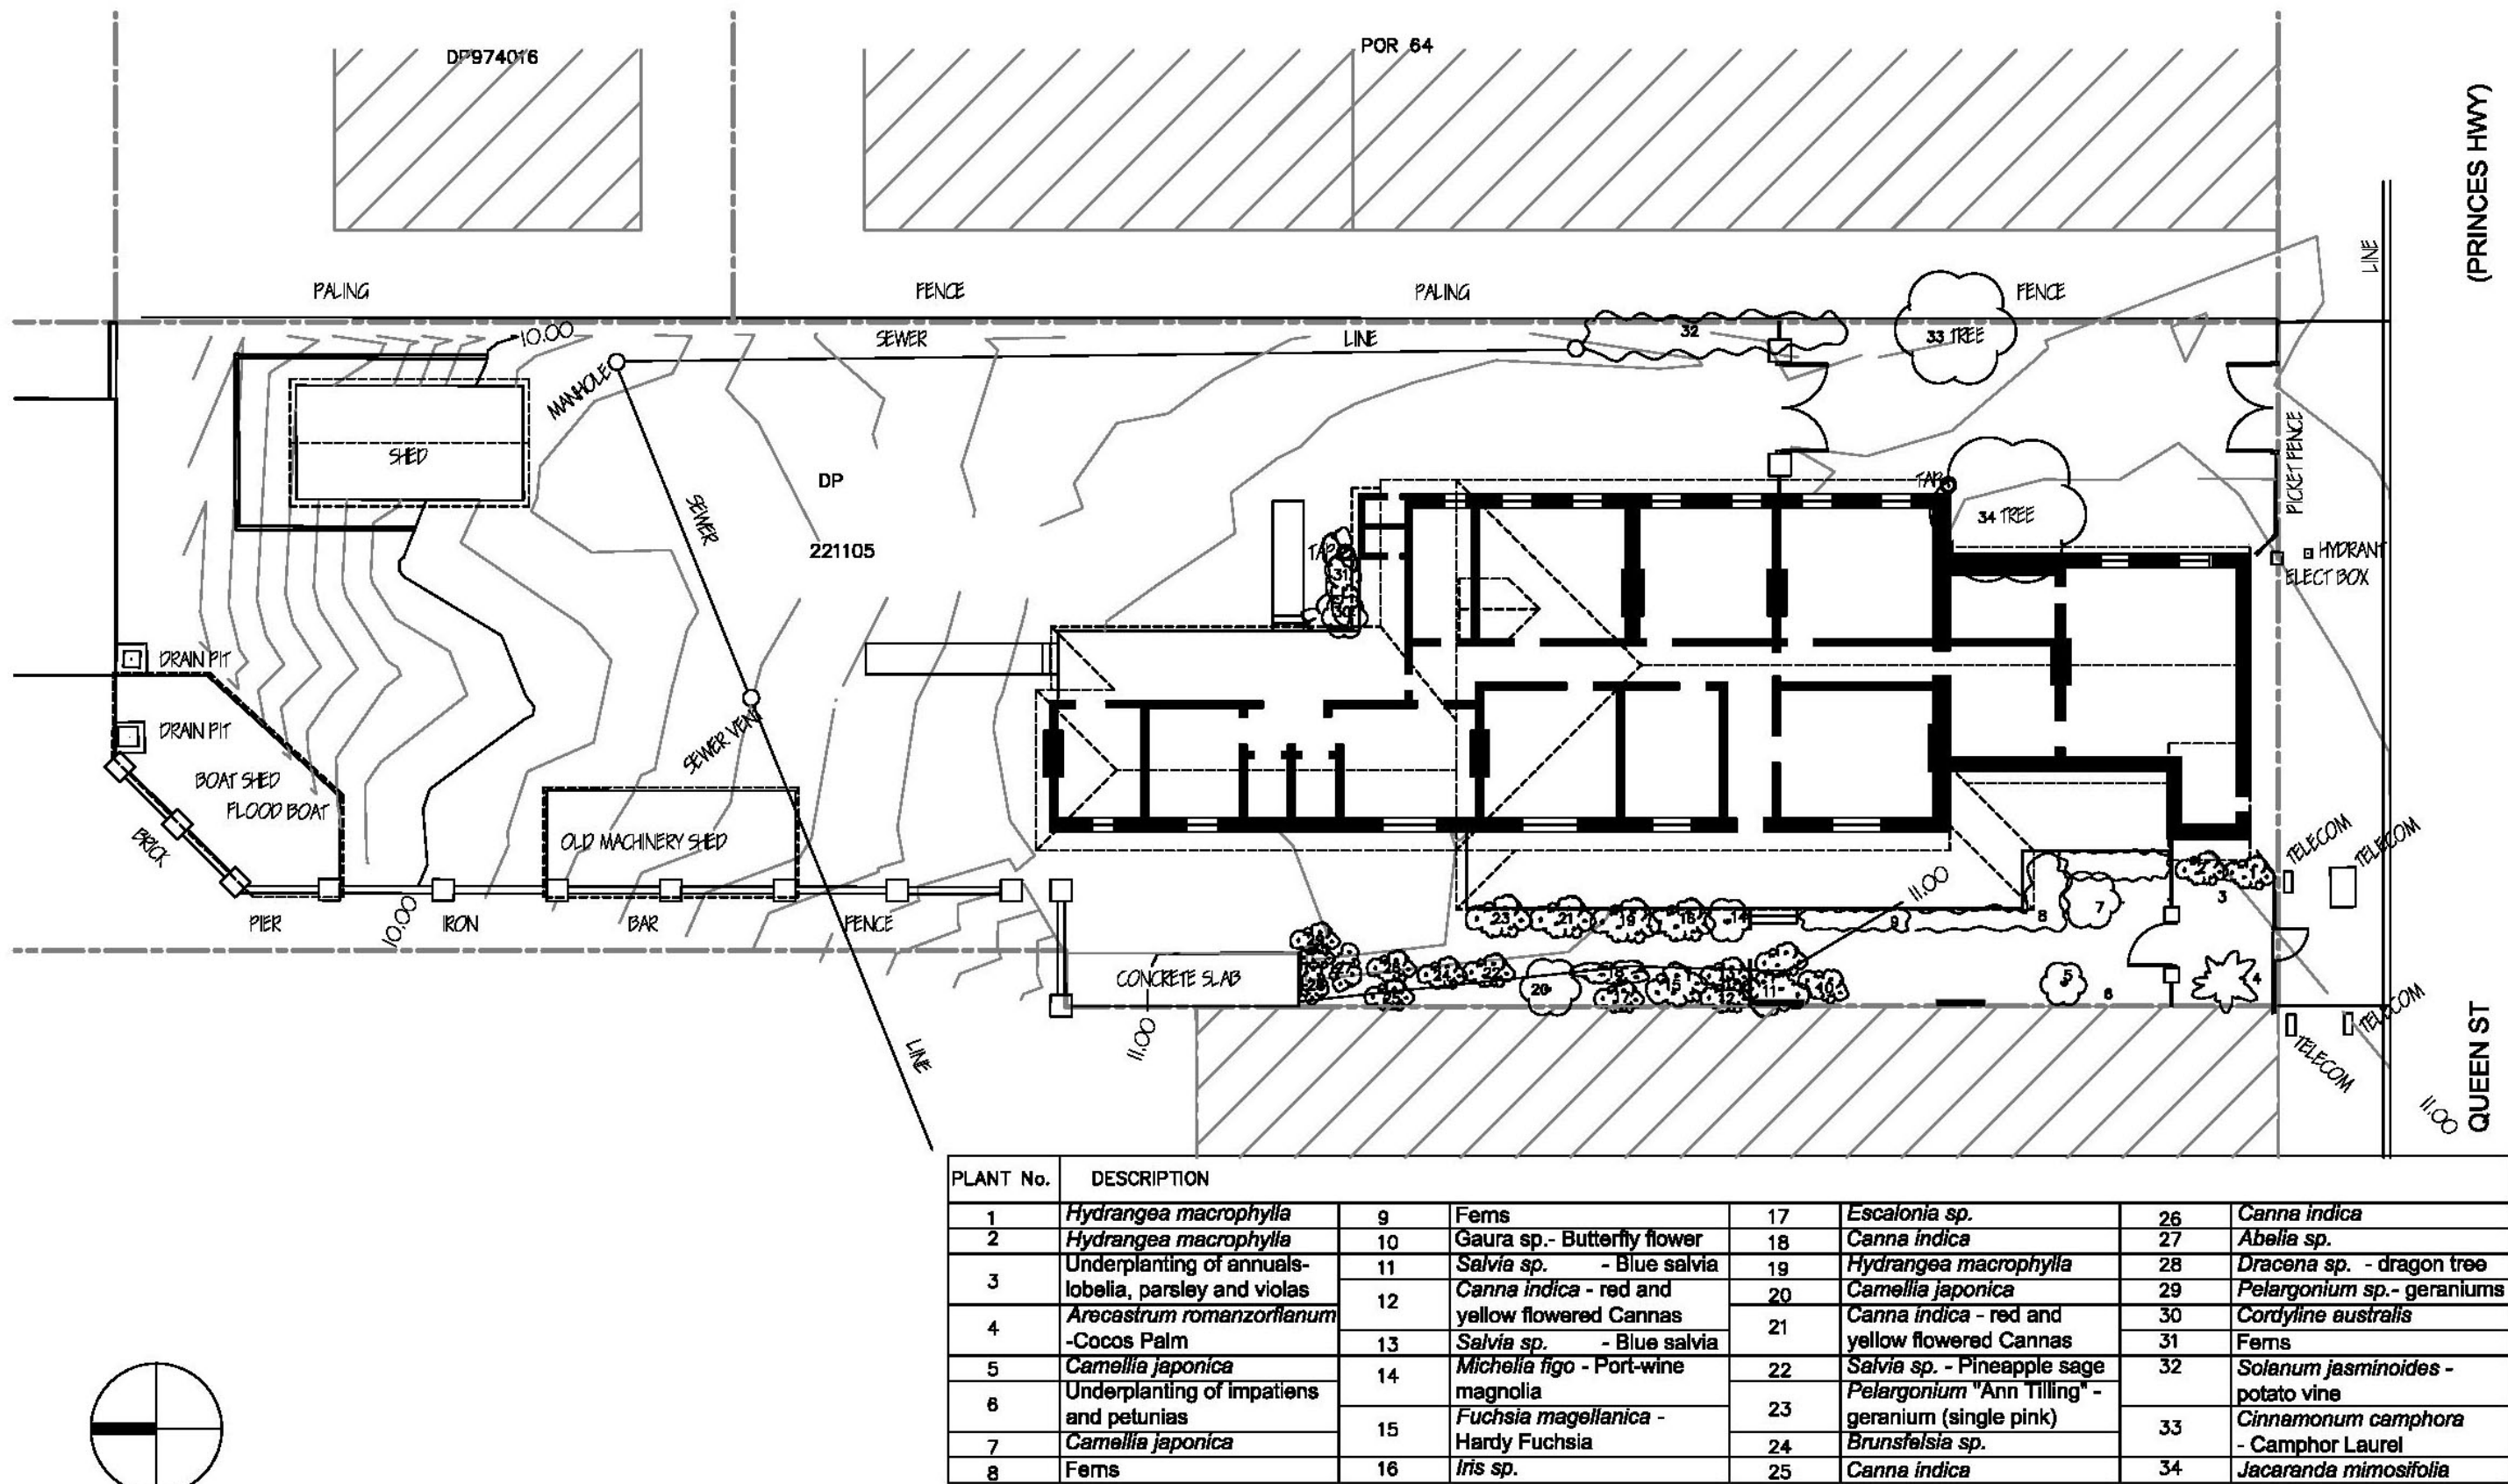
Plan of the subject site showing location of the existing vegetation and site features. Refer to the plant numbers and table above for details of individual plantings.
